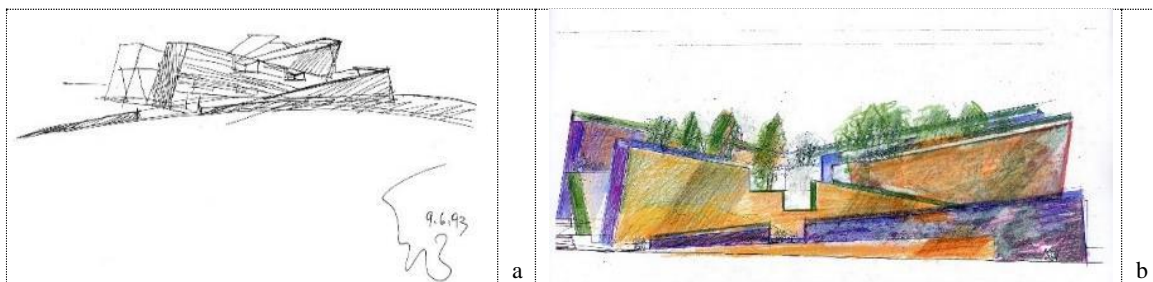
a. Sketches of the architect b. Hand drawings for the elevation (URL-302)
